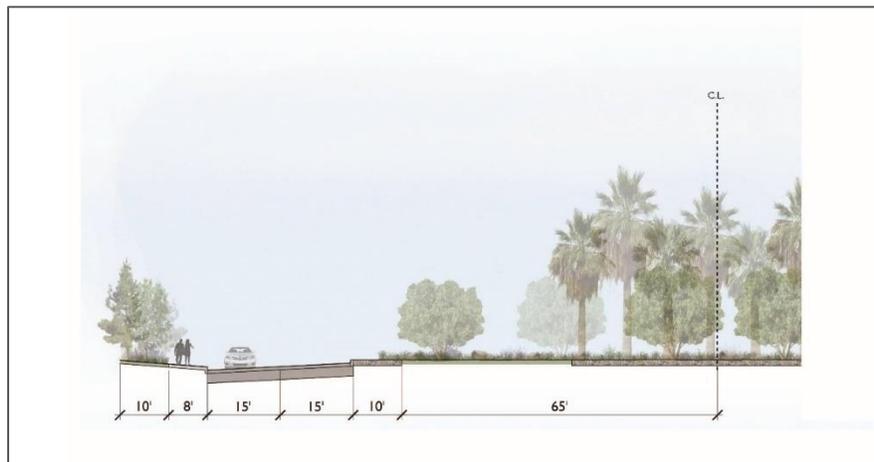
Major Highway Cross Section (Rubidoux Boulevard)
